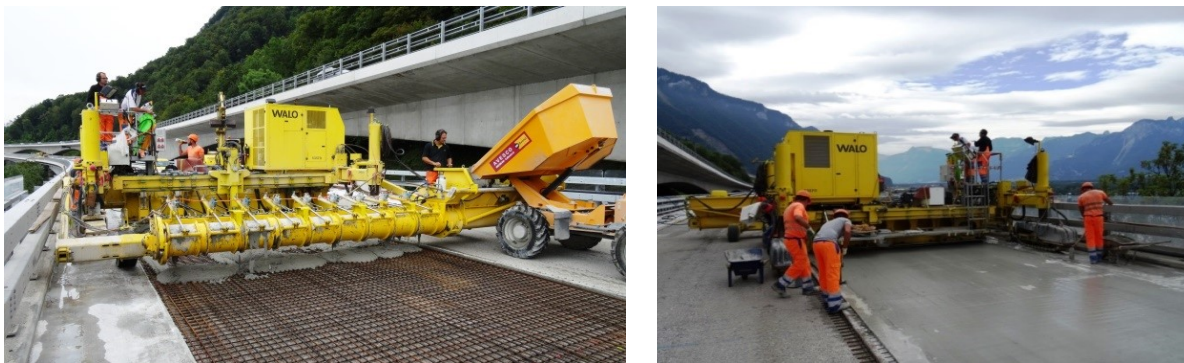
UHPFRC casting machine (left) and fresh UHPFRC layer after casting (right)
